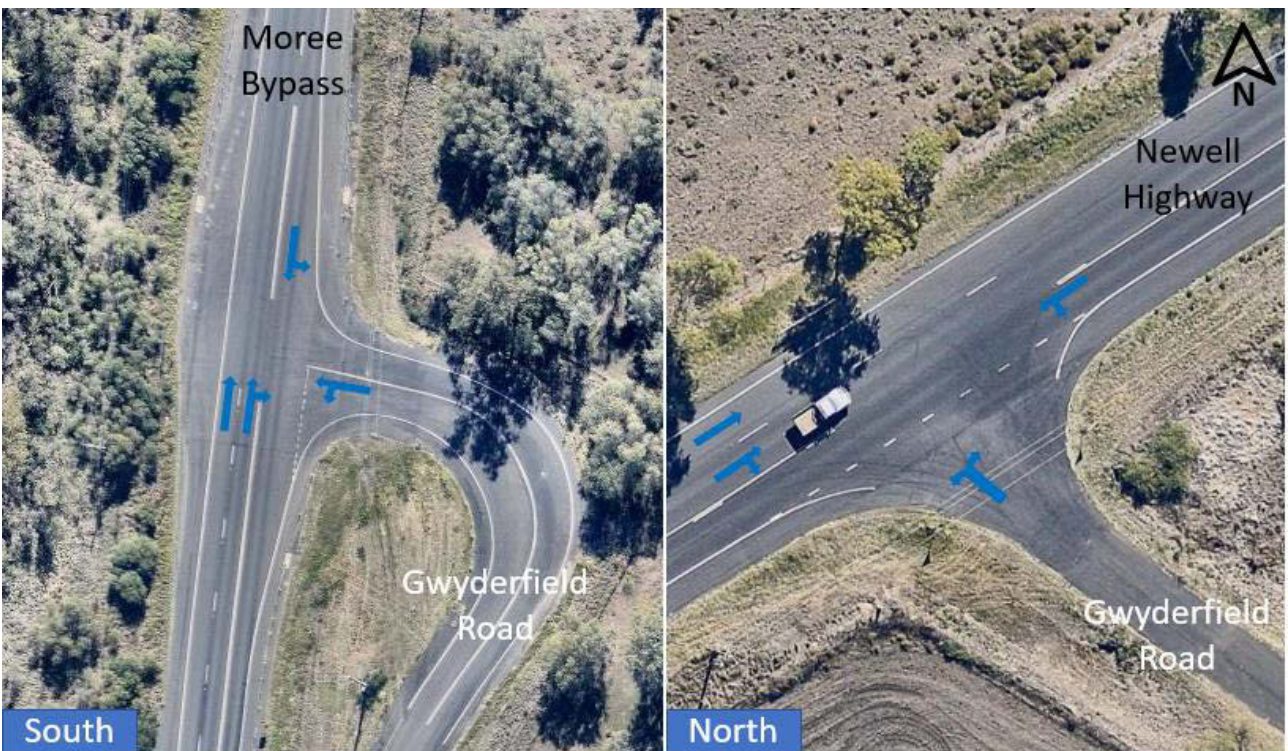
Moree Bypass / Newell Highway / Gwydirfield Road intersection layout and vehicle movements
